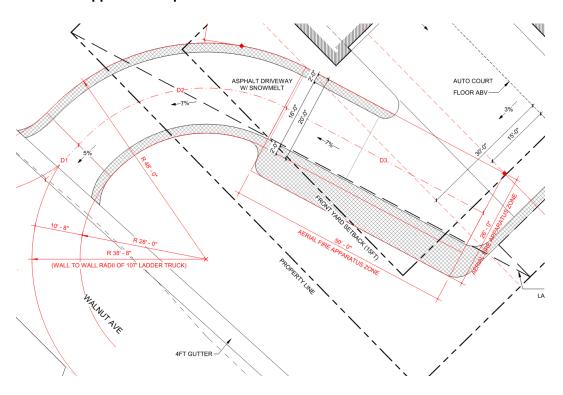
8/16 - Alternate Driveway & Garage Configuration:
